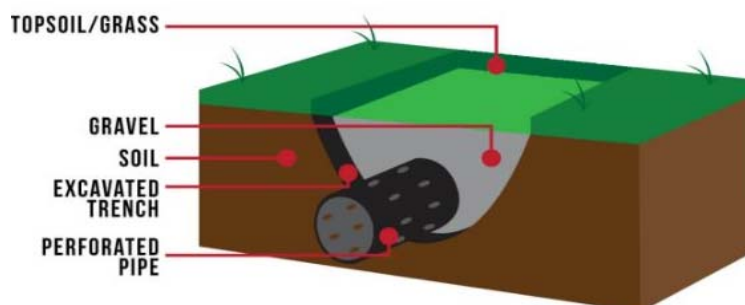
Typical French drain (Source: <https://northwestdrainage.com/wp-content/uploads/2020/09/northwest-french-drain-seattle-redmond-everett-drains.jpg>)
